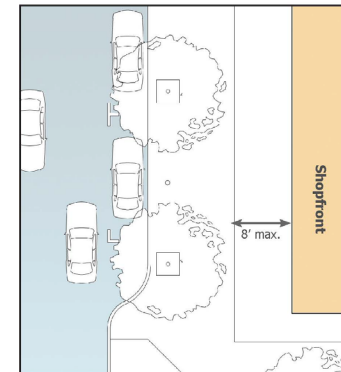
Plan View, Shopfront Frontage (Illustrative)
